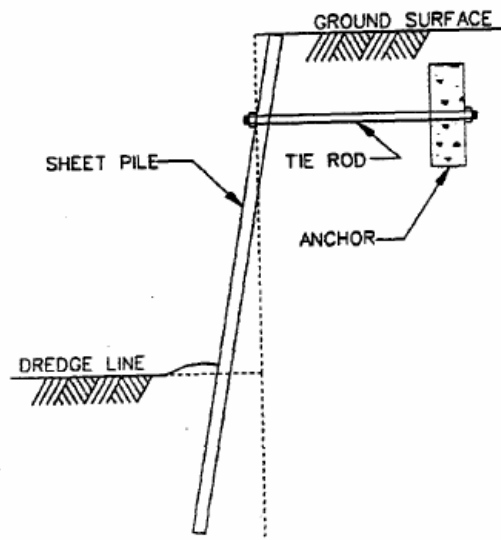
Anchored Wall (US Army Corps of Engineers, 1994).
